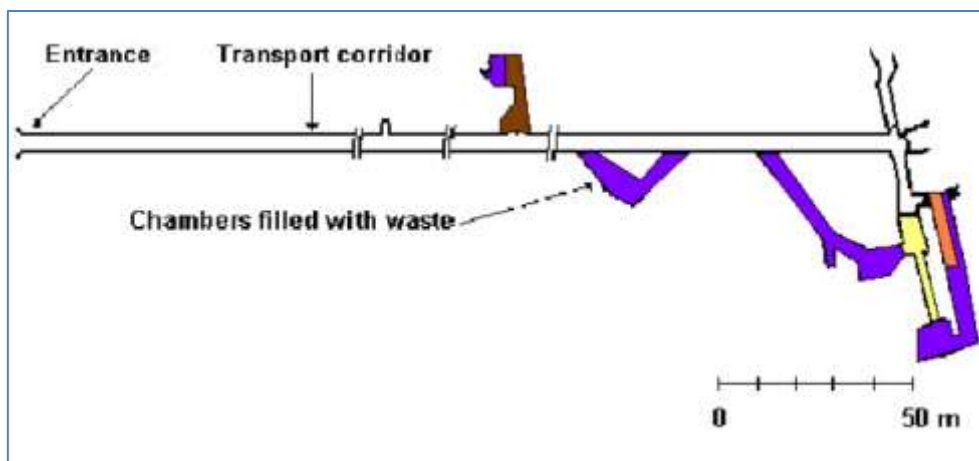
RAW disposal facility BRATRSTVÍ – layout [3]
